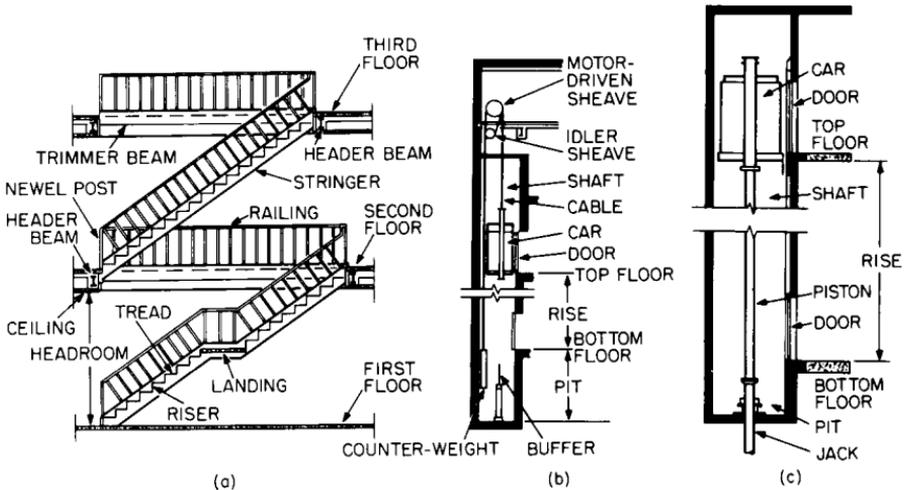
Vertical-circulation elements: (a) stairs; (b) electric traction elevator; (c) hydraulic elevator.
